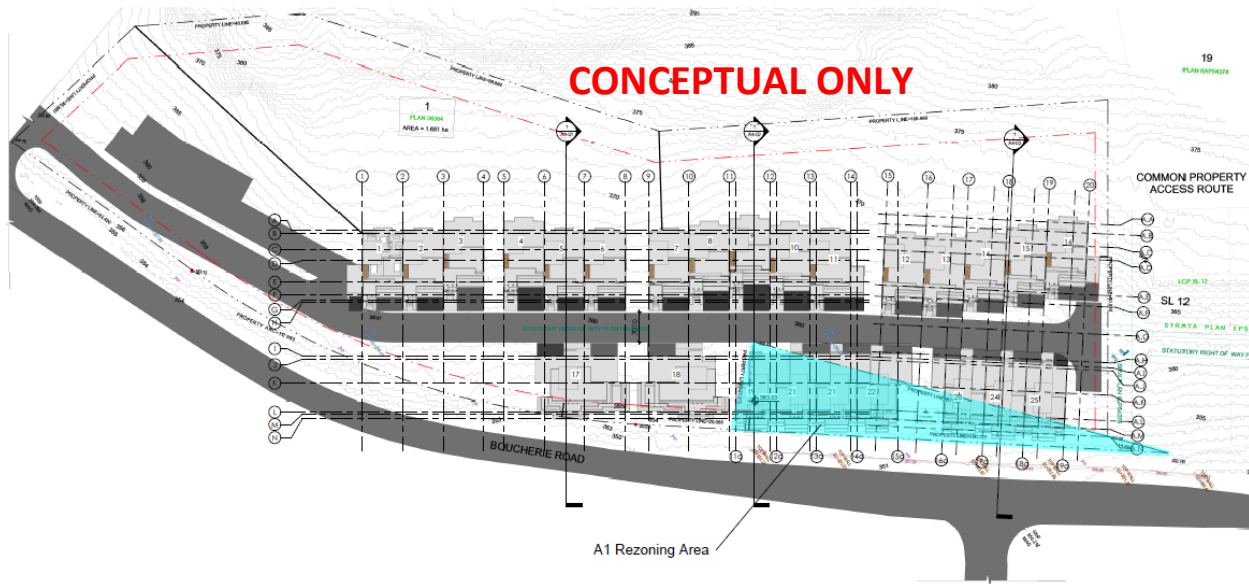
Applicants conceptual 25 unit townhouse plan noting the subject rezoning in blue. Future development permits would be required to facilitate the townhome development. This site plan has been enclosed as Attachment 3.
